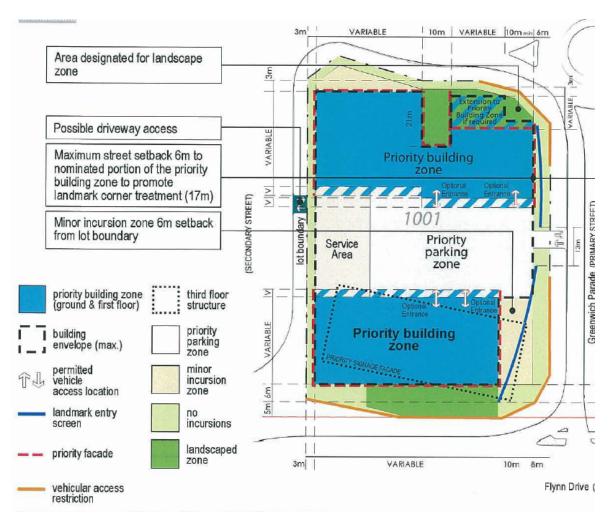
Detailed Area Plan No. 3 extract identifying Lot 1001
